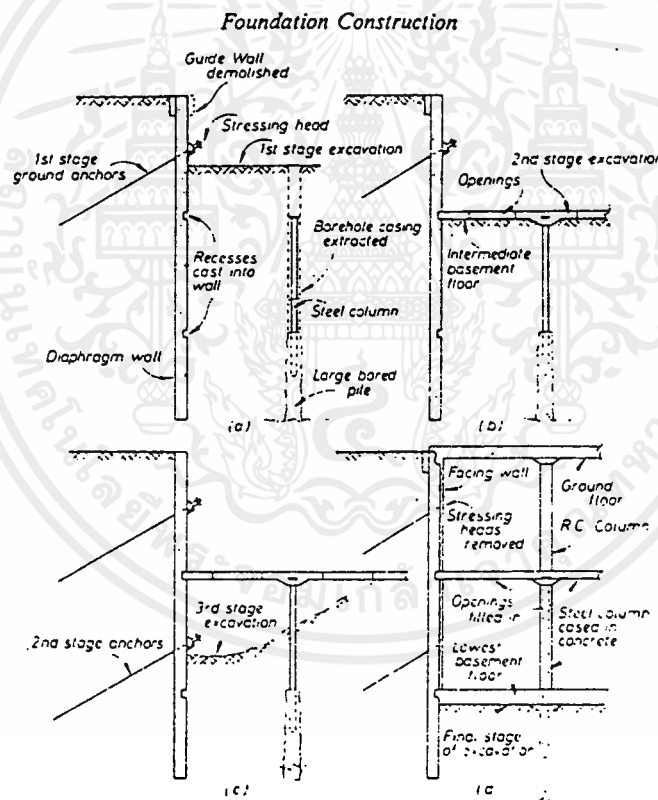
Illustration of bracing of cofferdams and pouring of concrete structures when against the piling.
